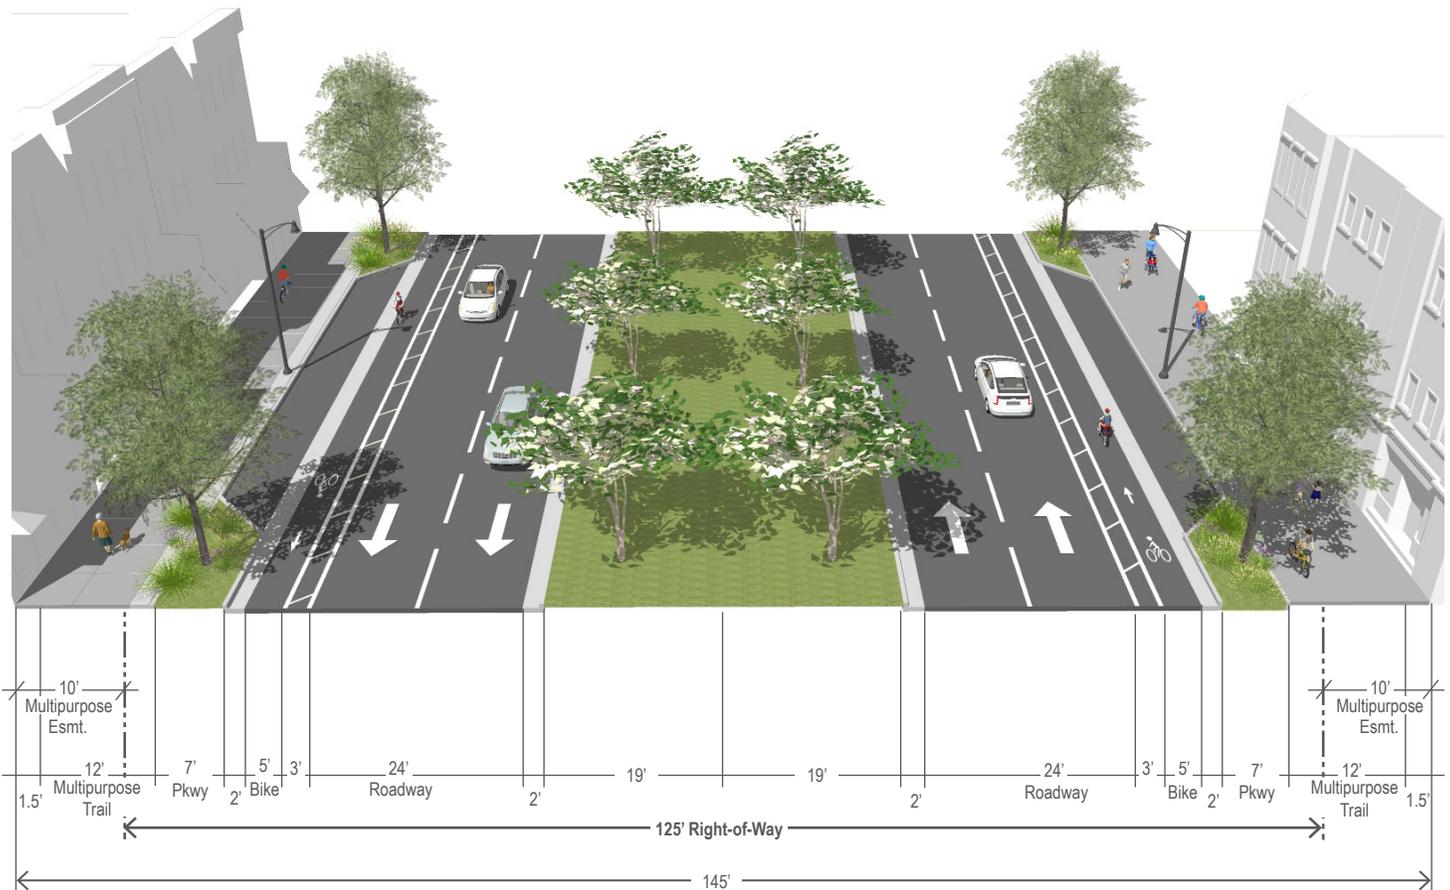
(a): First and Second Order Street Typical Section in T4/T5
